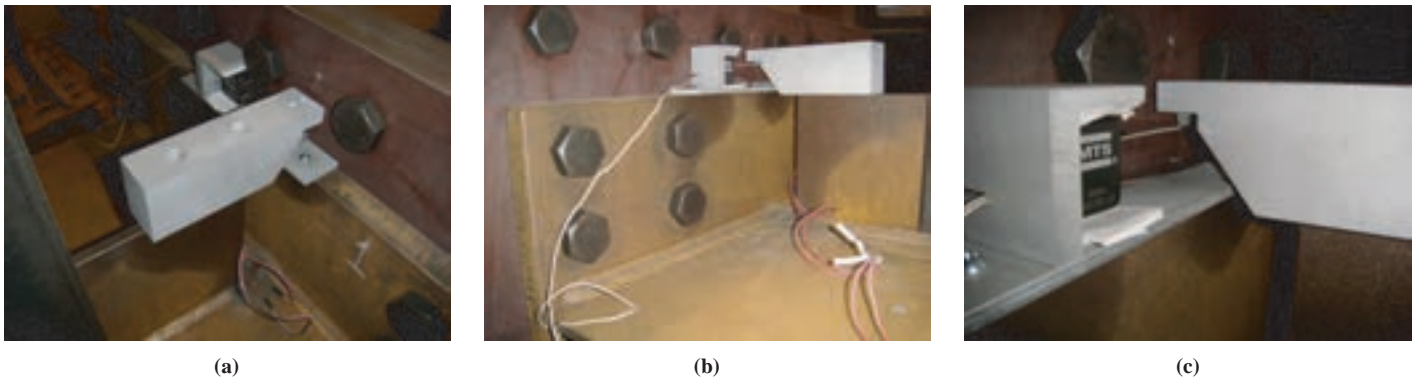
MTS clip-on gage fitted in aluminium attachment.
